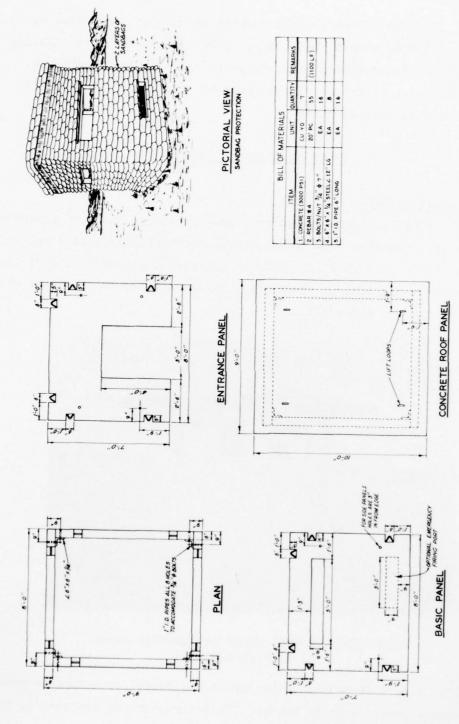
Structural plans for precast concrete panel security bunker (from Reference 54) (sheet 1 of 2)
